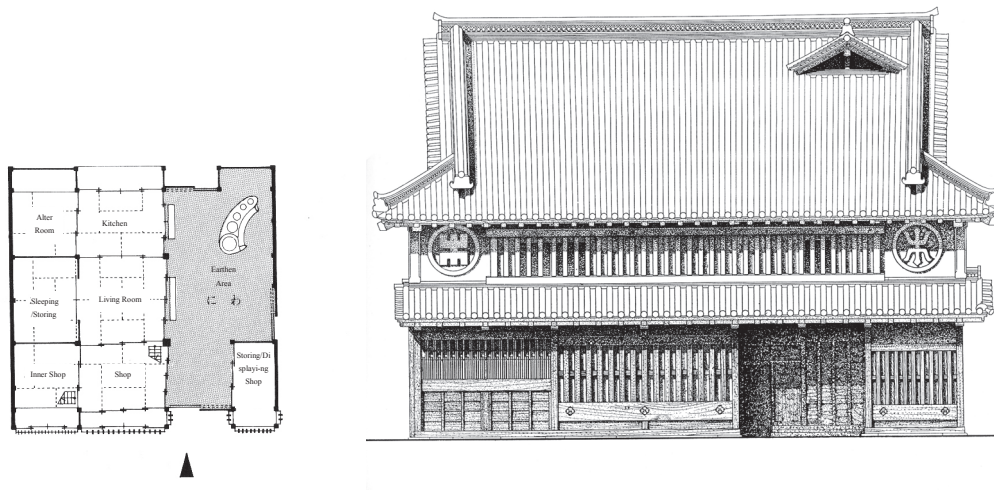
A Typical *machiya* in Imai (Nara Pref.). Toyoda House, Plan and façade (Suzuki 1980, p. 140)
